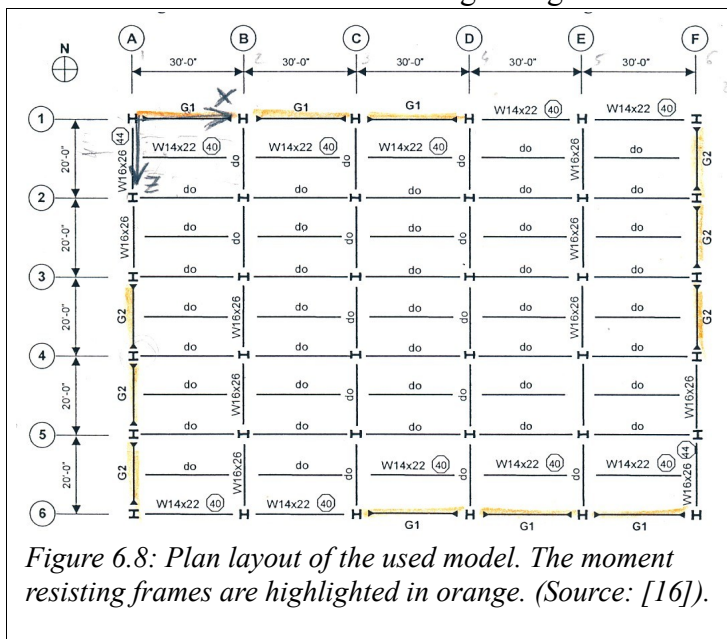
Plan layout of the used model. The moment resisting frames are highlighted in orange. (Source: [16]).
